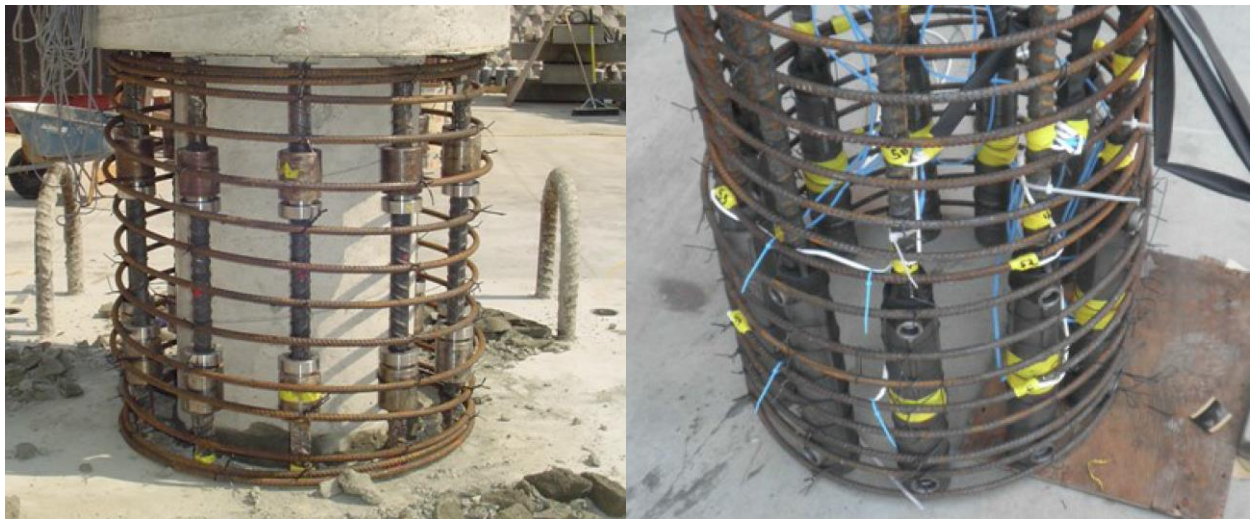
Upset headed coupler and grouted sleeve connection (from Haber et al. 2013)
